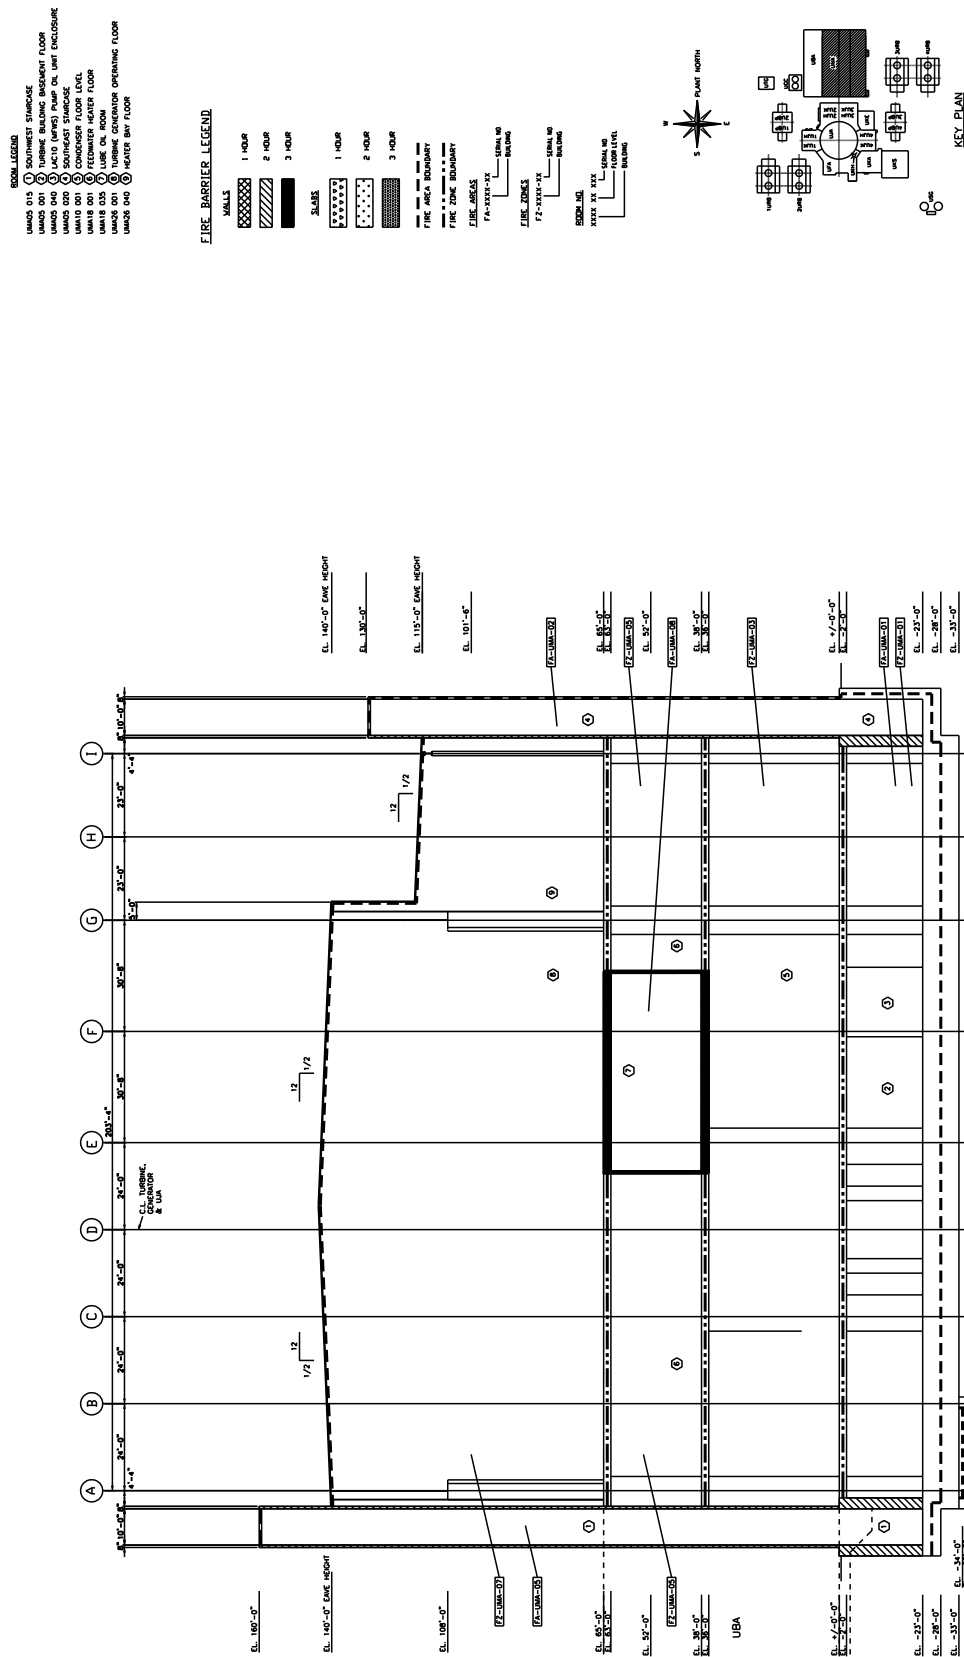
B-9—{Fire Barrier Location, Turbine Building Section C-C}
